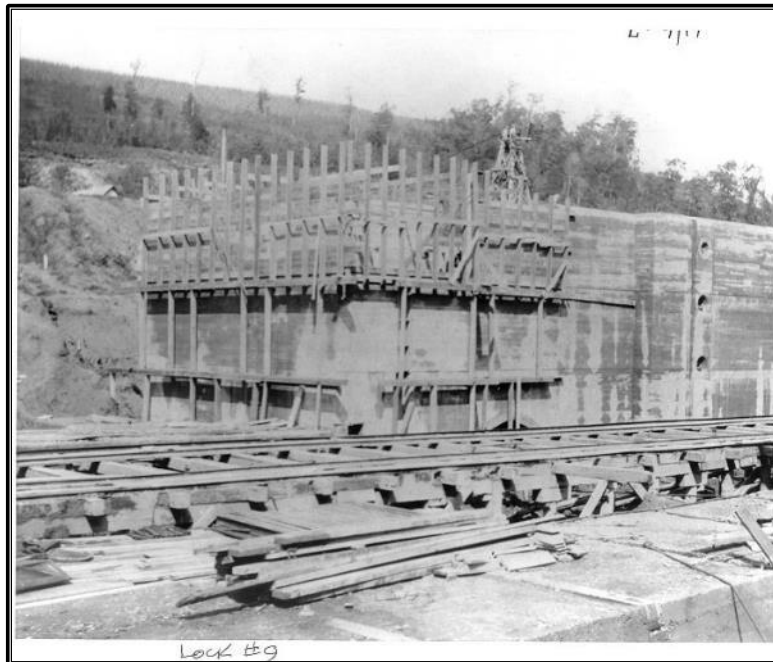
Construction photograph of Lock and Dam No. 9 showing wood form used to mold the concrete, courtesy of Stantec.
